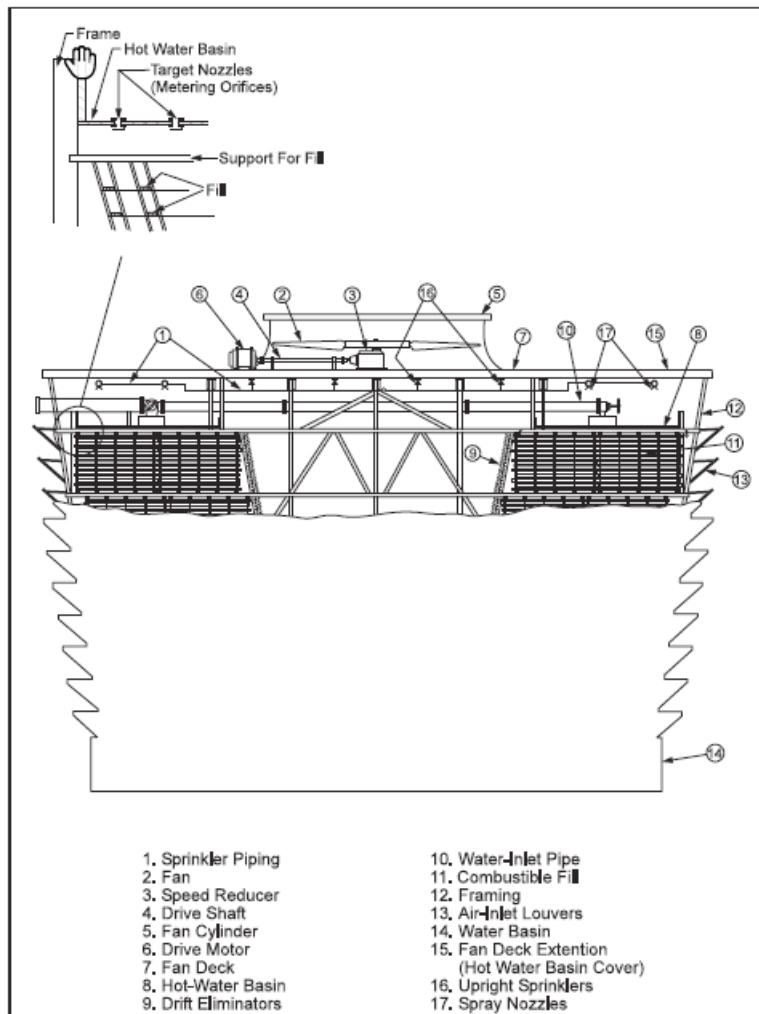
Typical cross section of a crossflow induced-draft cooling tower (covered hot water basin)
